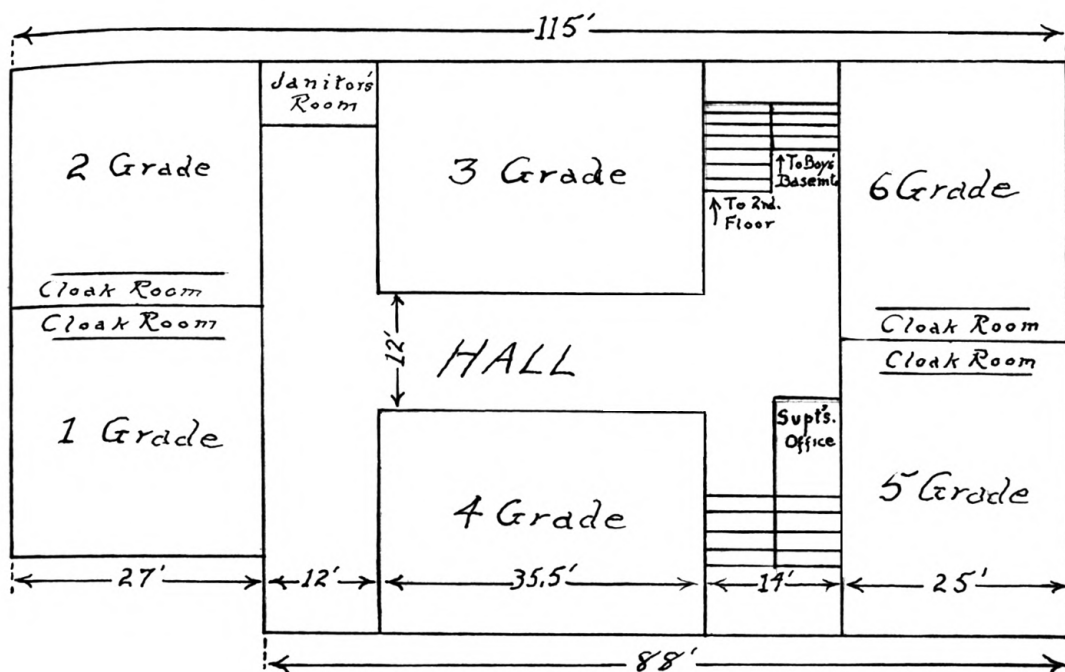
Floor Plans, Dimensions and Assignments of Space for the First Floor of Building
